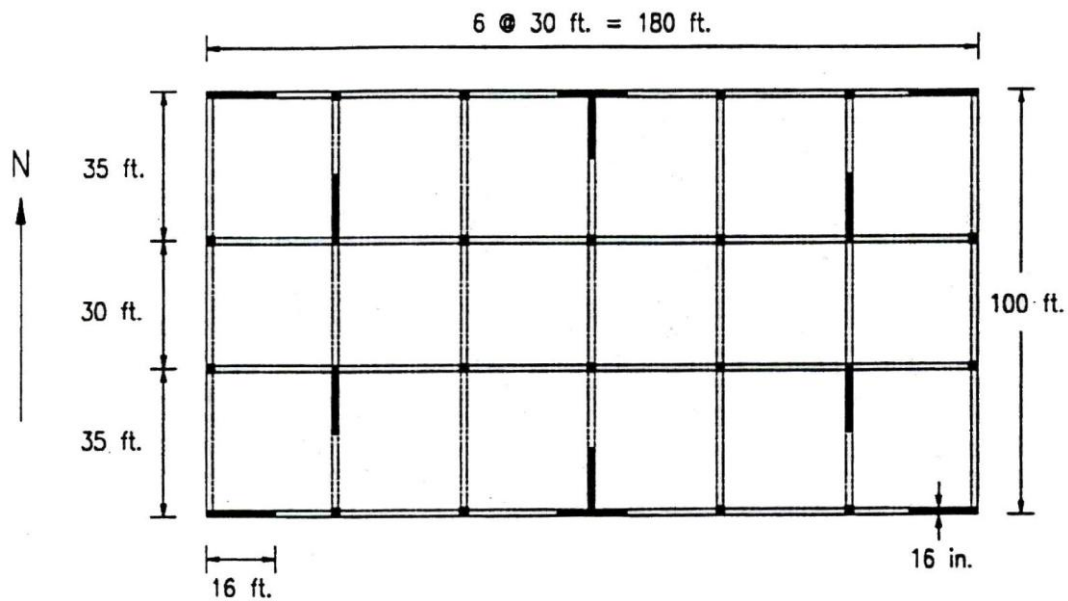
The Floor Plan of the Prototype Building chosen by Thomsen & Wallace [1995]
